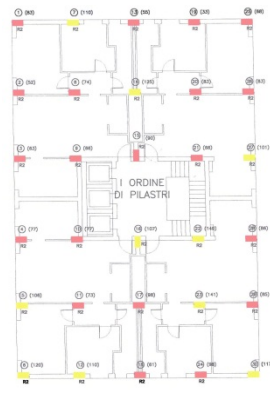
A 20-story high-rise building, and a general floor, with reported the strength values on reinforced concrete columns.
